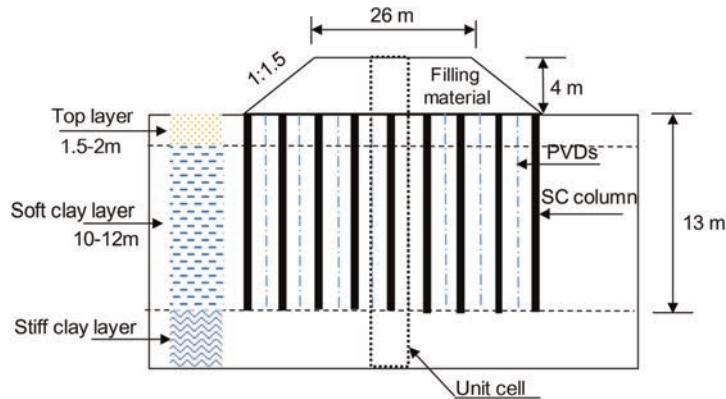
Cross-section of composite foundation under test embankment in Huai-Yan highway (Nguyen *et al.* 2022).
